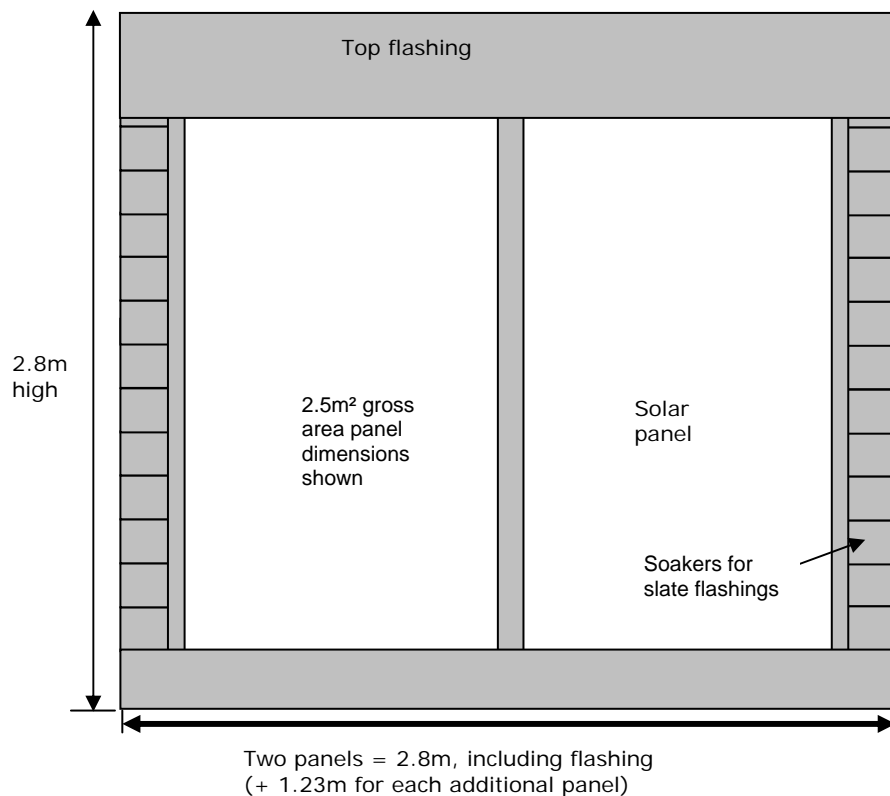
Plan of flashings for 2-panel Integra IDMK Collectors on slated roof
